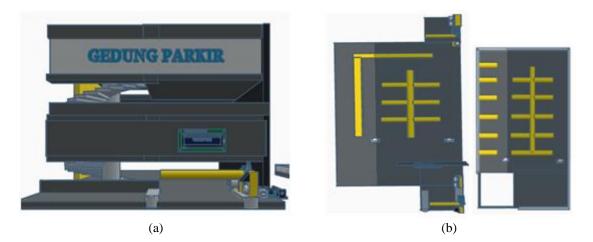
Design of proposed smart parking (a) Front view, (b) Floor form.
